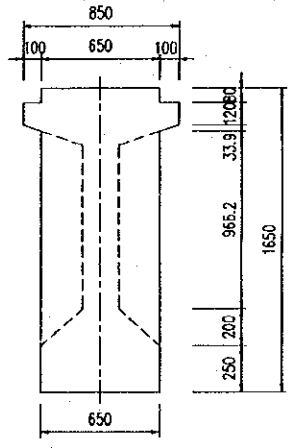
DETAIL OF SUPER STRUCTURE FOR CAI DA BRIDGE
